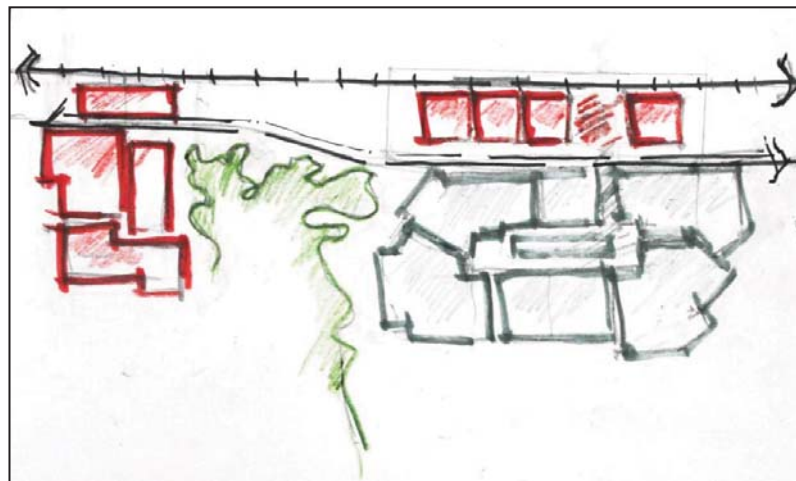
Scheme of Joint form B1 (Source: State committee of civil engineering and architecture in Soviet Union, 1967 and revised drawing by author)
